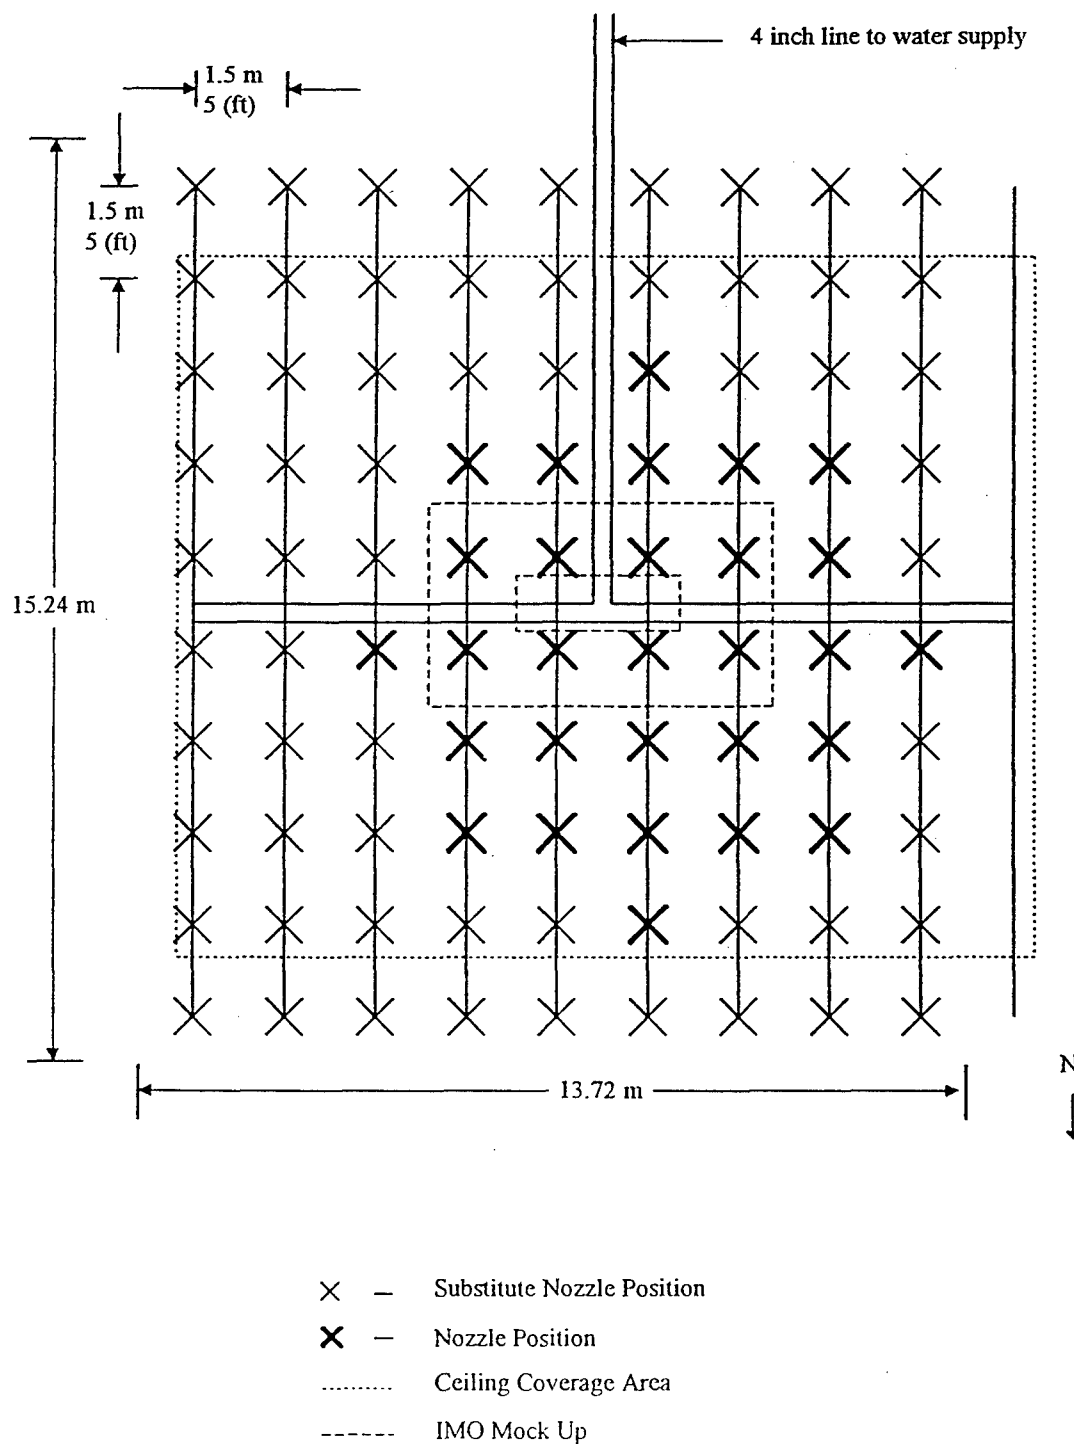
Mist Nozzle Layout Showing Ceiling and Wall Locations
